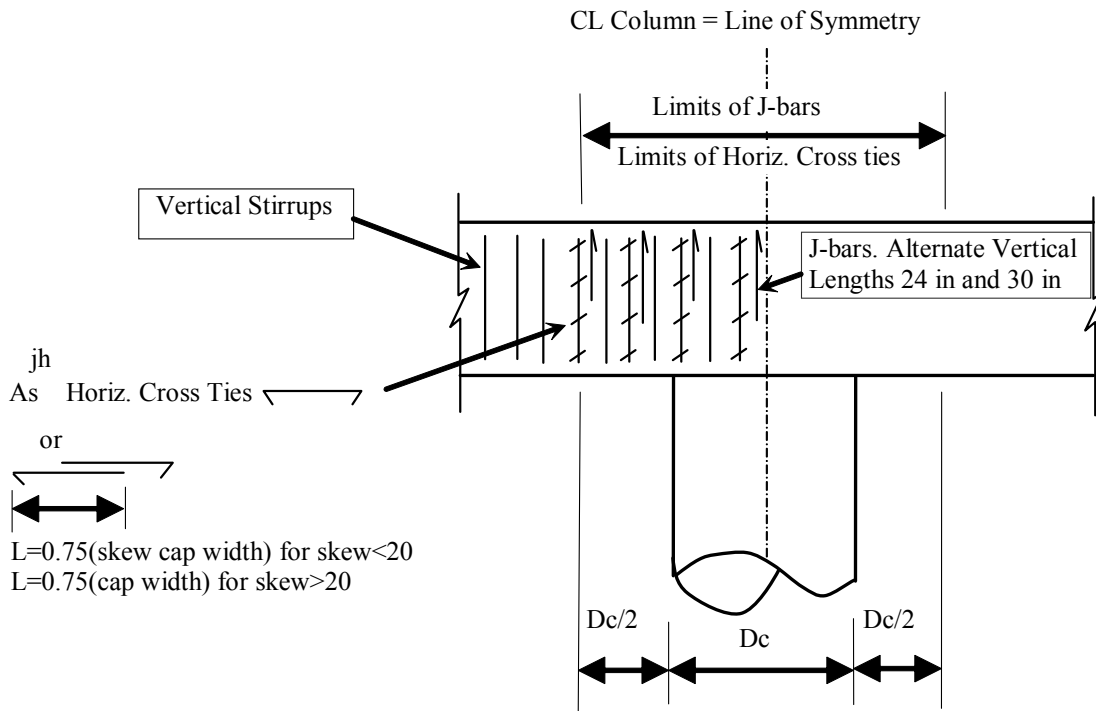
Location of Horizontal Joint Shear Reinforcement¹²
